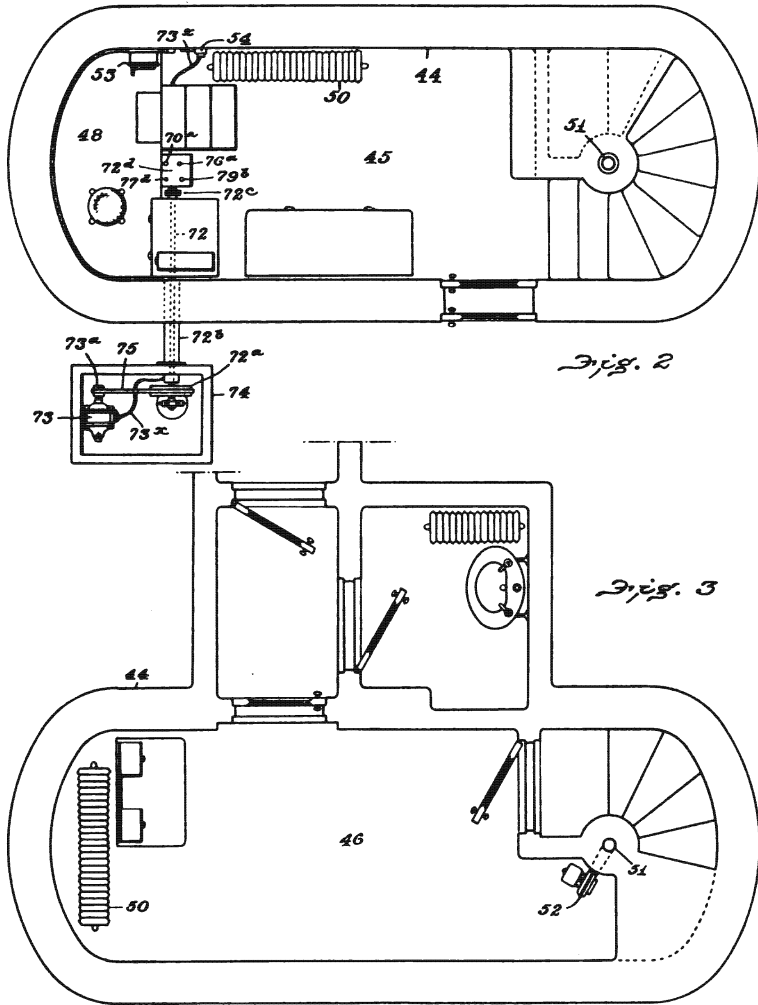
FLOOR PLAN OF THE UPPER COMPARTMENT OF OBSERVING ROOM AND THE BOX OUTSIDE THE BUILDING IN WHICH THE MOTOR IS LOCATED
